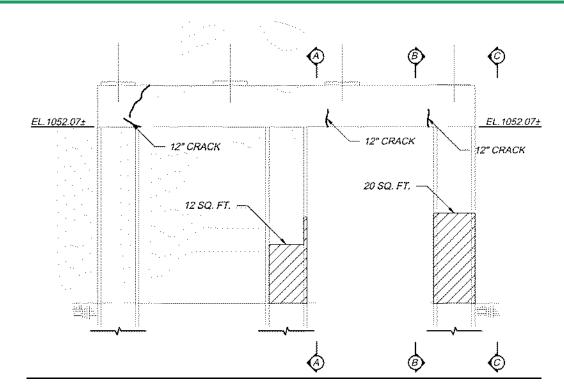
Location of Proposed Concrete Repairs - Pier 3 Downstation (North) Face Elevation MP 182.1
